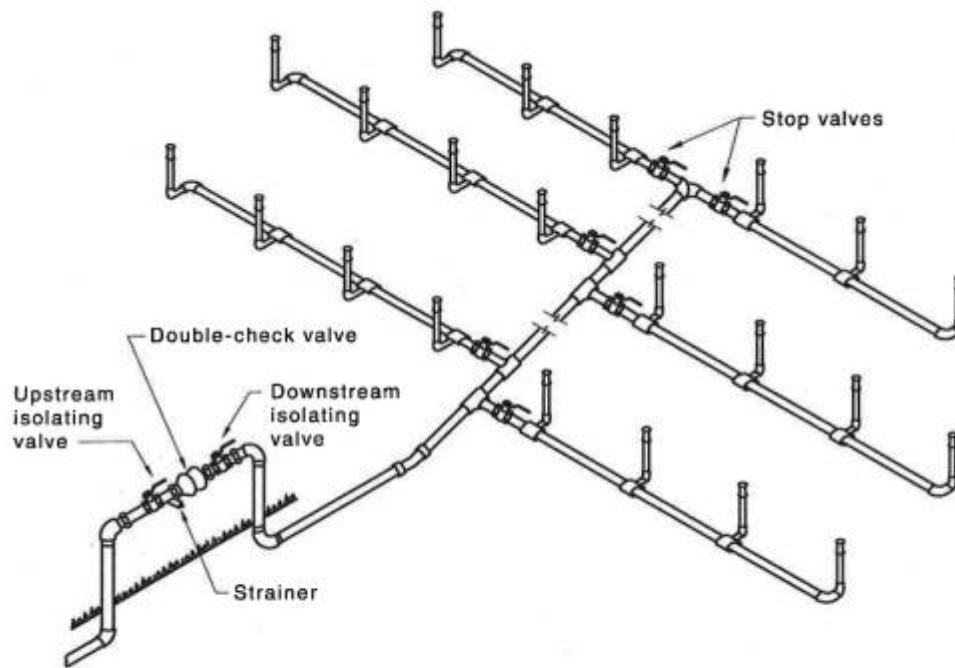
(E) TYPE C SYSTEM—TESTABLE DEVICES SUBJECT TO BACK-PRESSURE OR NO BACK-PRESSURE FOR HILLSIDE OR MULTI-ZONE SYSTEM—DOUBLE CHECK VALVE ASSEMBLY
